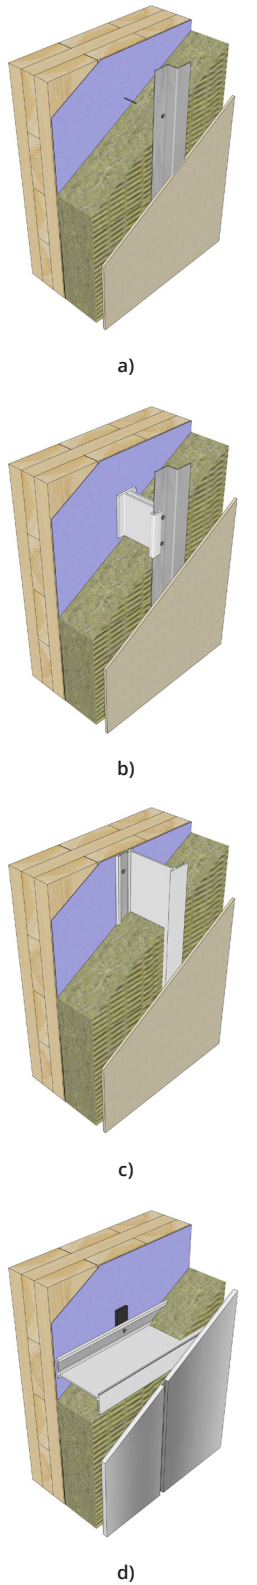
Four cladding attachment options: a) long screws with furring strips, b) clip and rail system, c) vertical girts, and d) horizontal girts.
